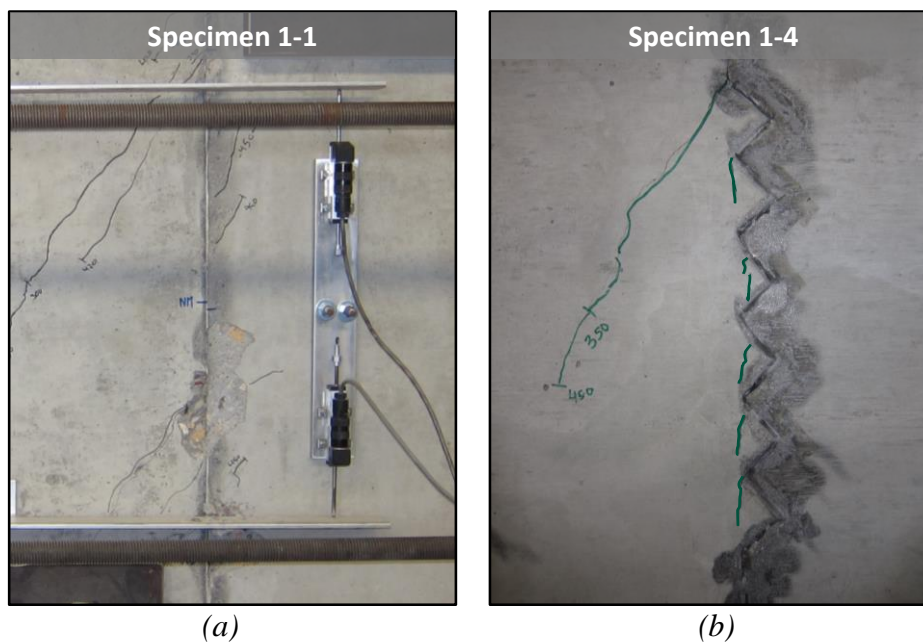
Distress at smooth interface and 1-in. saw teeth – (a) Specimen 1-1 after failure; (b) Specimen 1-4 prior to failure
